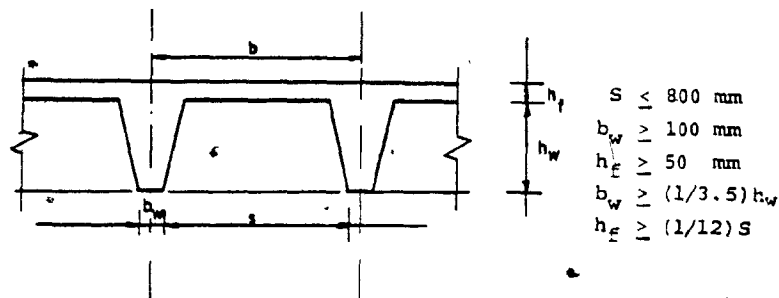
DIMENSIONAL REQUIREMENTS FOR JOIST FLOORS
